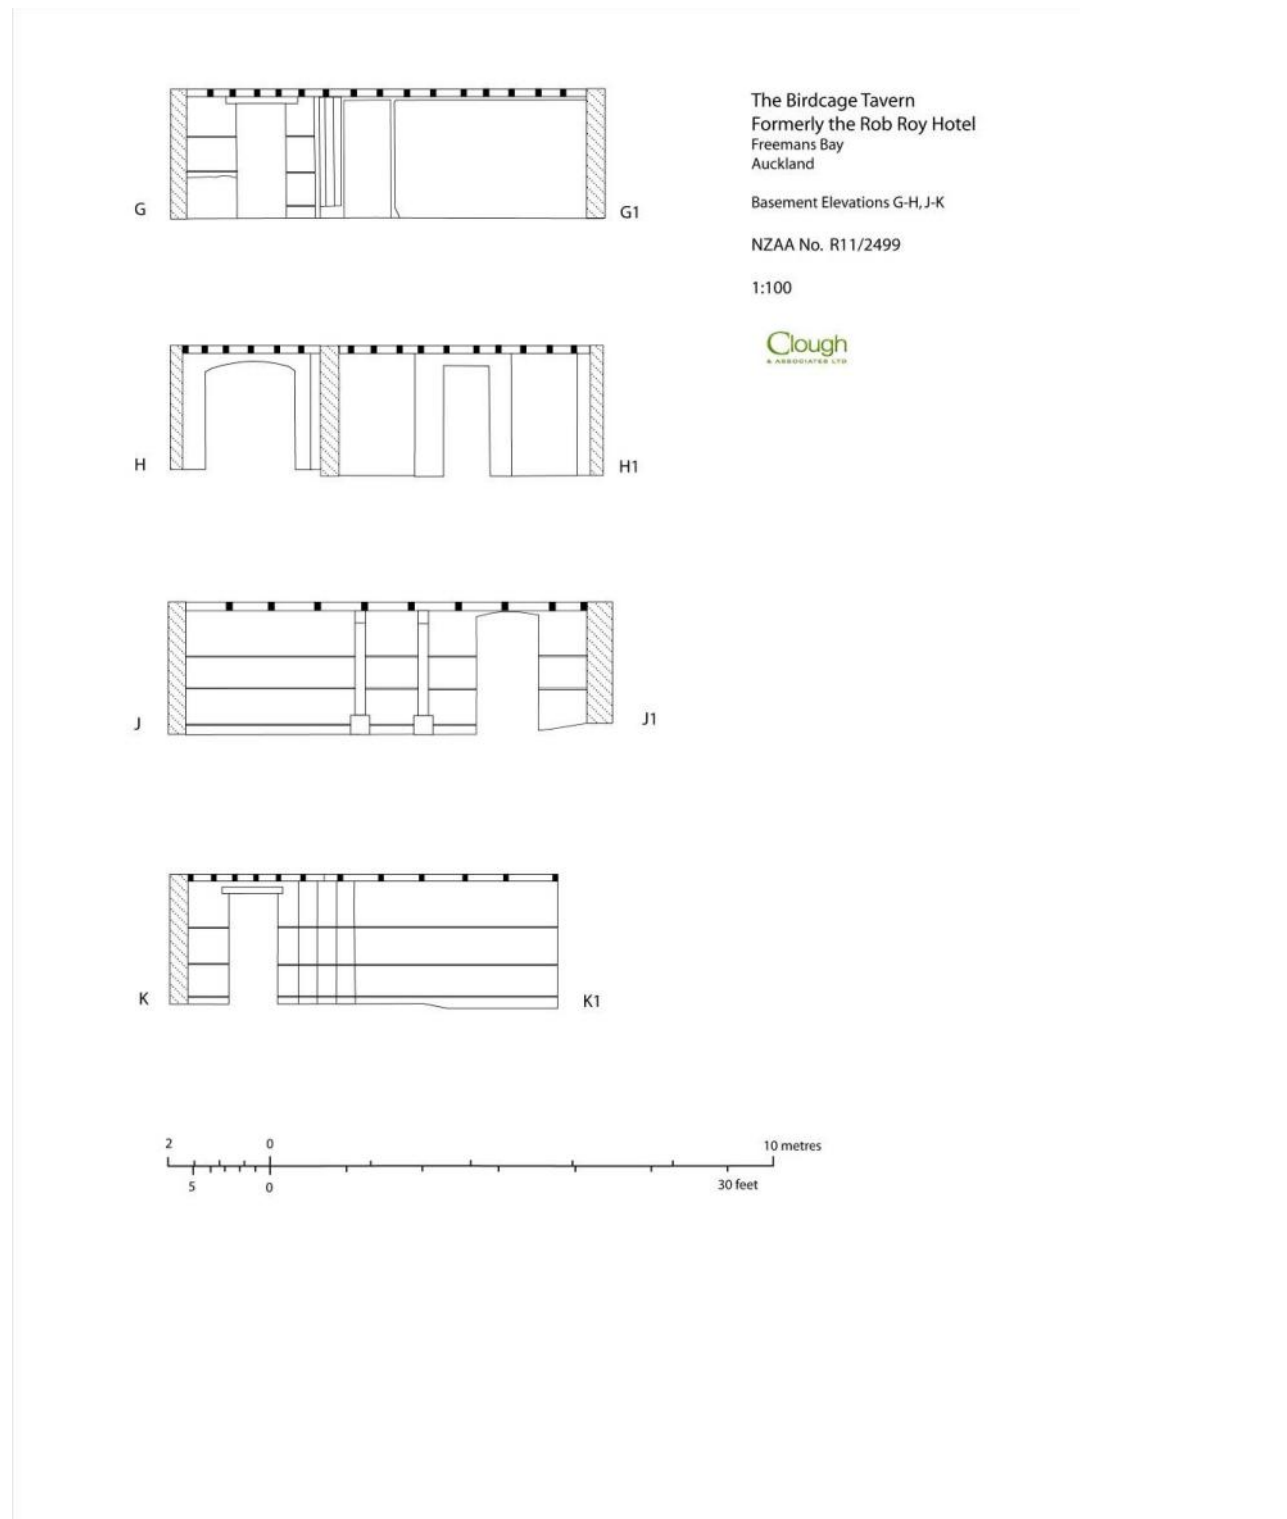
Rob Roy Hotel basement elevation drawings, walls G-H, J-K. (NB. Scale is 1:100 at A4 scaled only)
